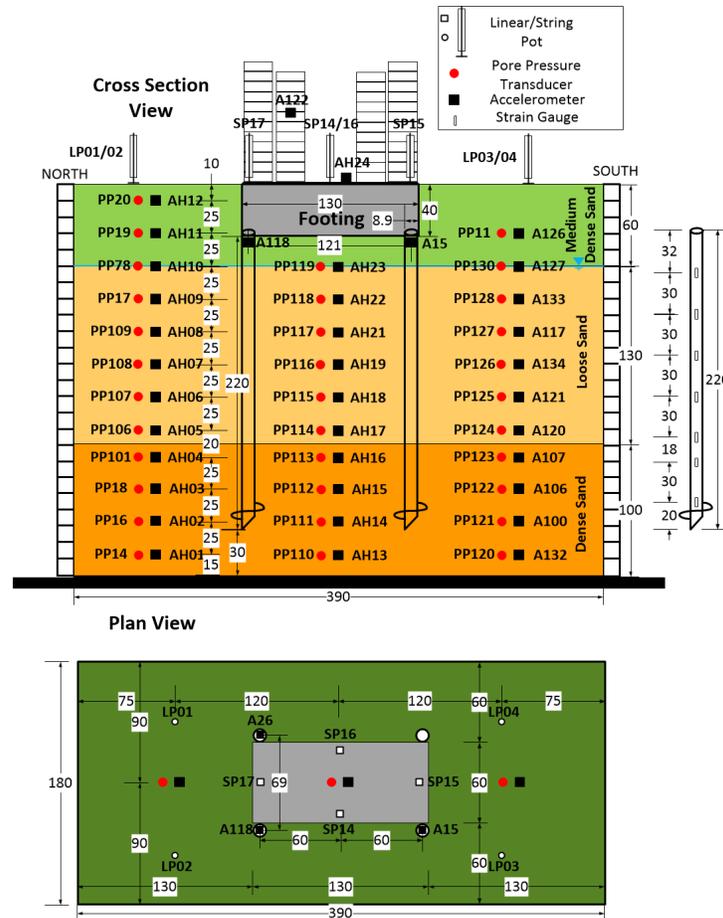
Model configuration and instrumentation plan for helical pile test (All dimensions are in centimeters).
